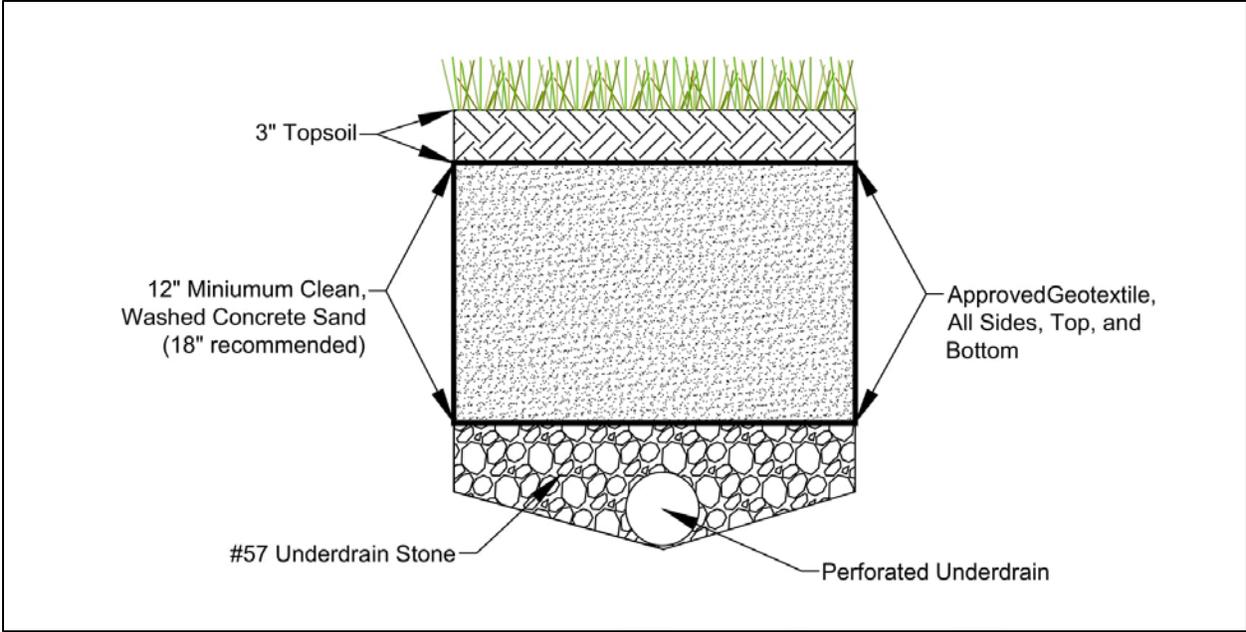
Typical schematic for a nonstructural or surface sand filter (note: material specifications are found in Table 4.44).
